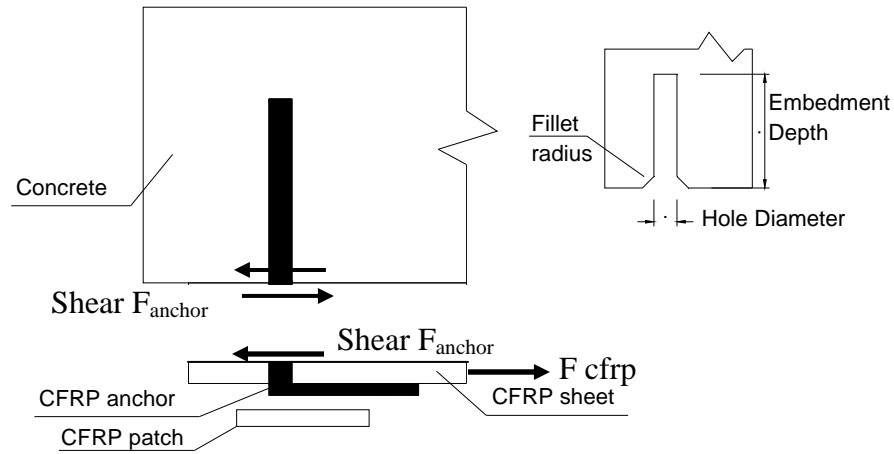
Plan View details of CFRP anchor and CFRP patch
